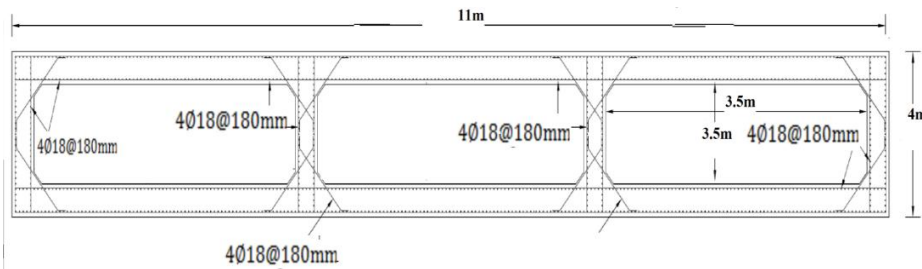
Structural section of the culvert detailed of both longitudinal and transverse reinforcing steel.
